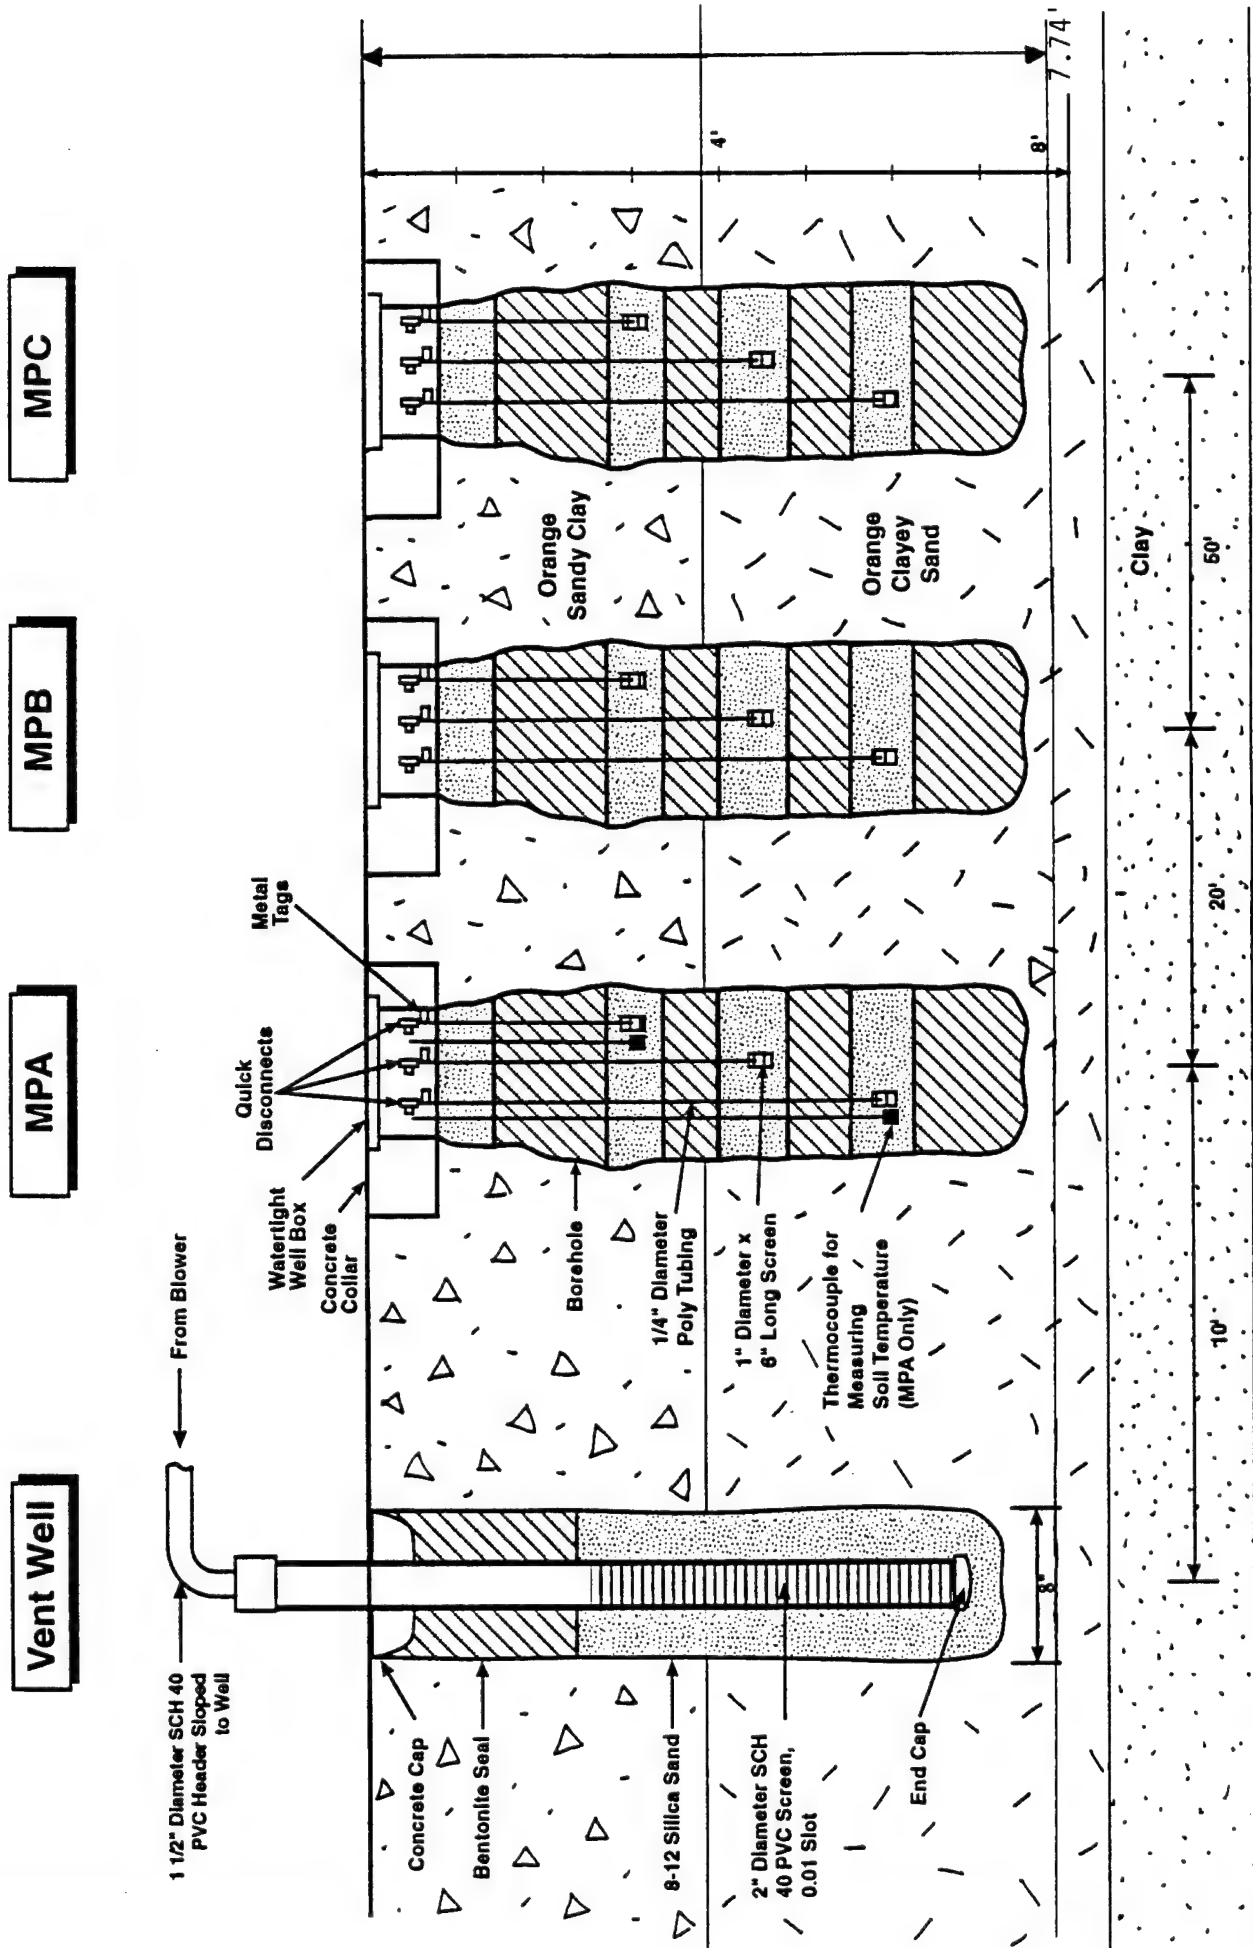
Cross Section of Vent Well and Monitoring Points Location at Site SS-10 Showing Site Lithology and Construction Detail
